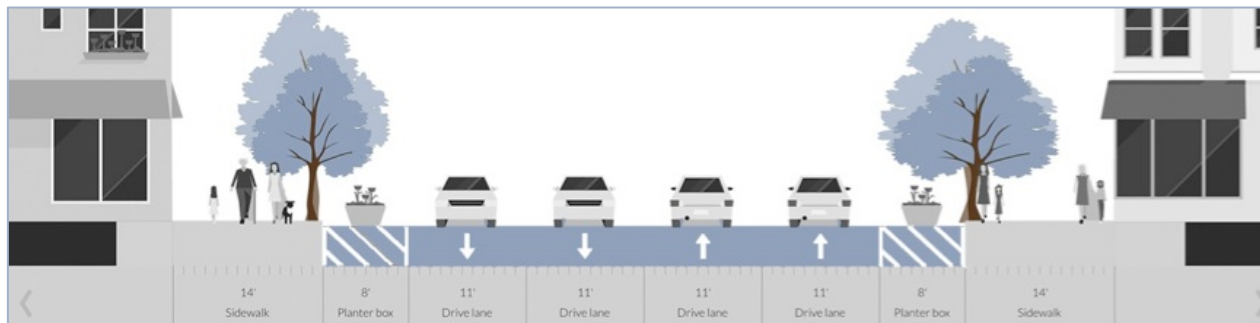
10 Existing Lincoln Avenue Cross -Section (Typical for Mid-Crosswalks)
